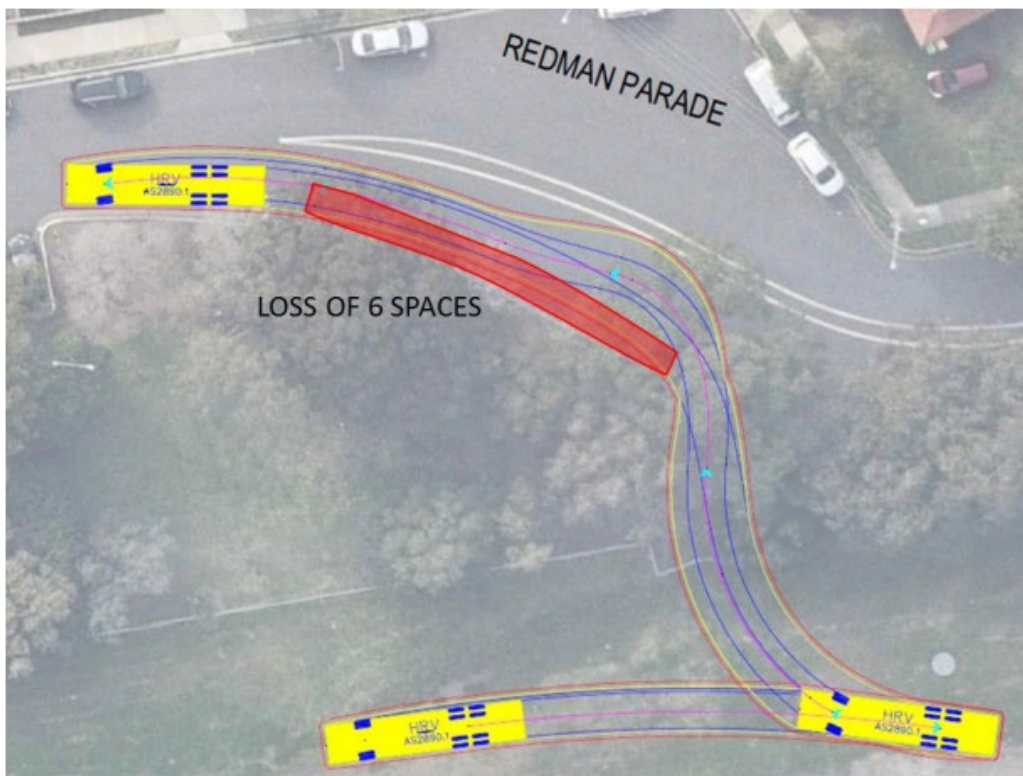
BE3 – M24 13.701U Parking Space Loss
